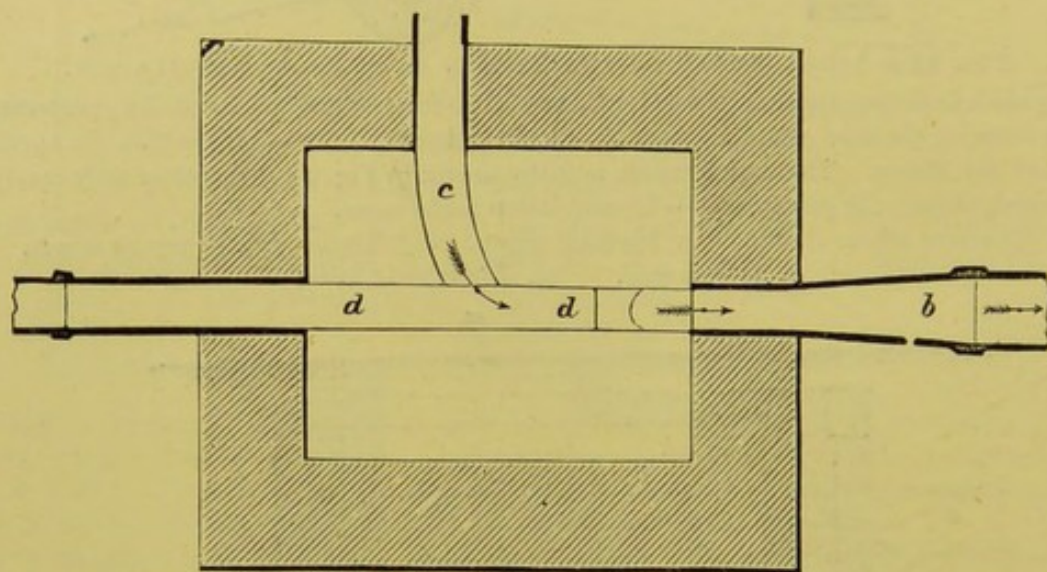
PLAN OF INSPECTION CHAMBER.
